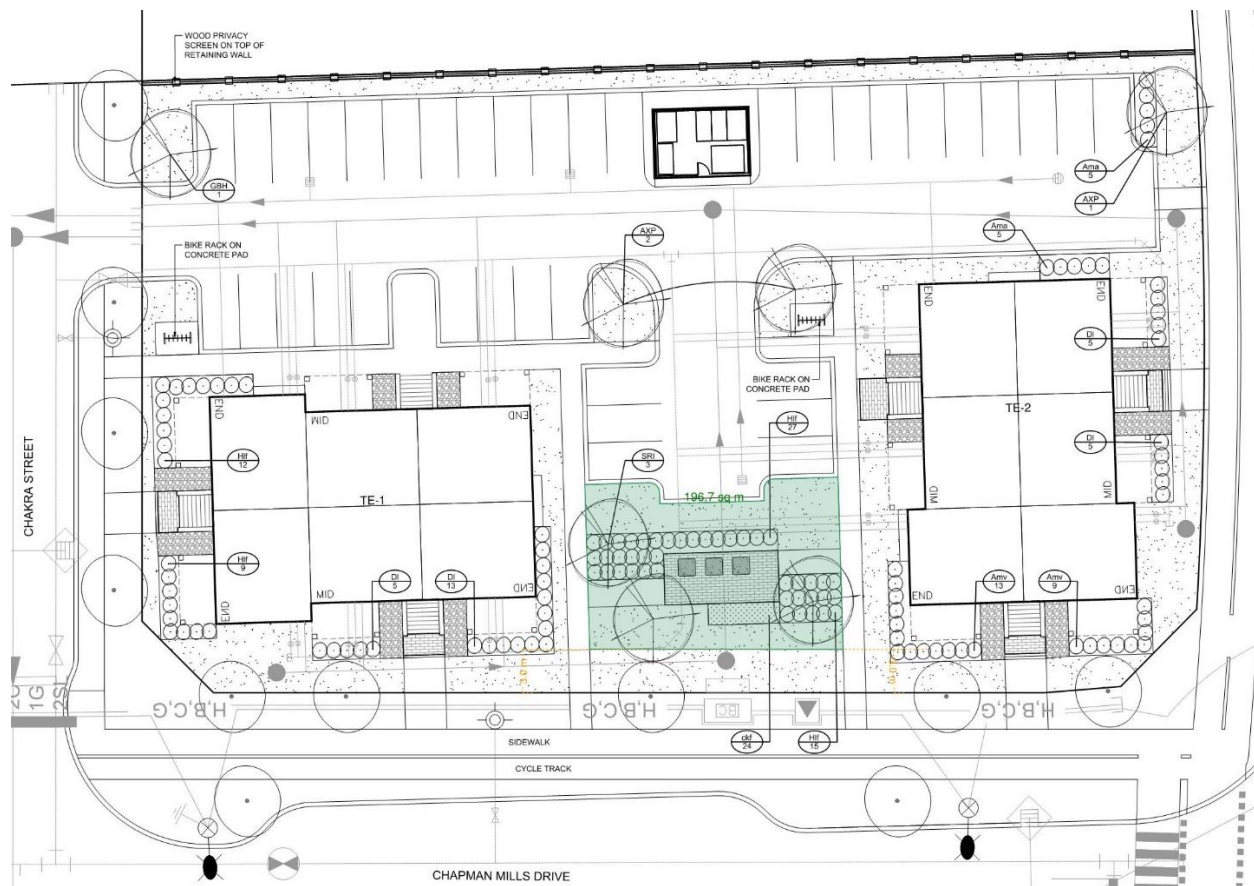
Shared Outdoor Amenity Area as Shown on the Landscape Plan
